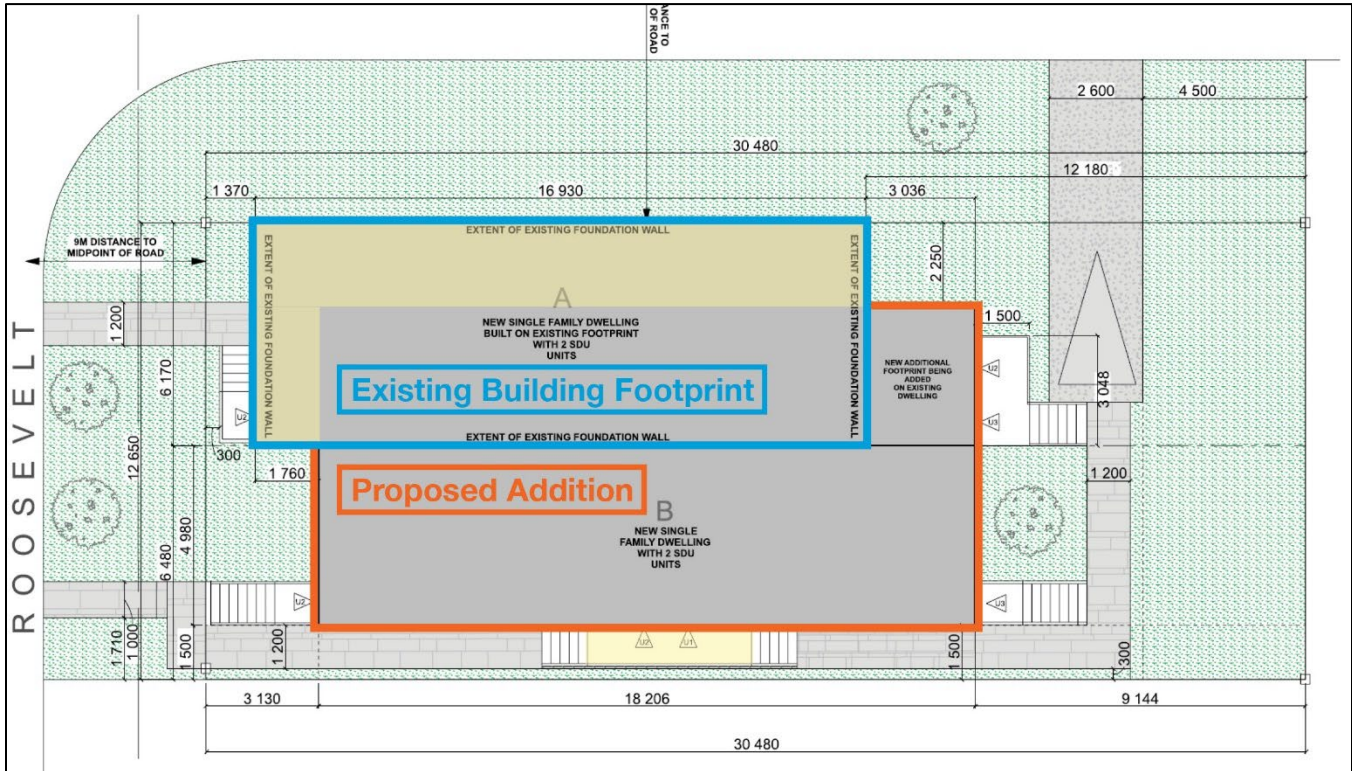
Proposed Site Plan (minor variances are highlighted in yellow)
